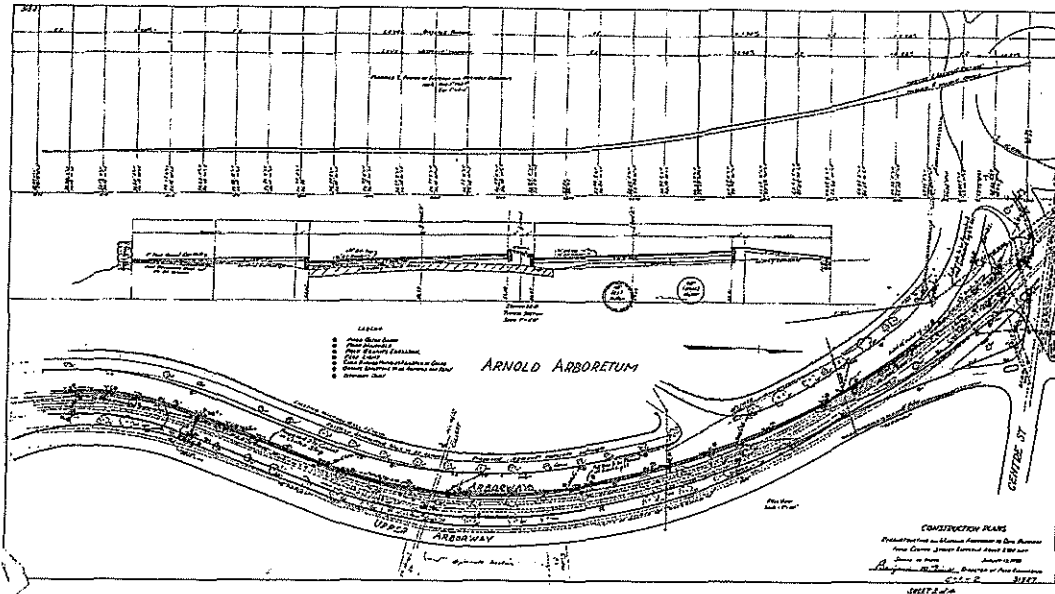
Plan Titled “Construction Plans Reconstructing and Widening Arborway to Dual Parkway from Centre Street Easterly about 2700 Feet” Sheet 2 of 4, by Benjamin W. Fink, August 17, 1953 (MDC # 31527).
